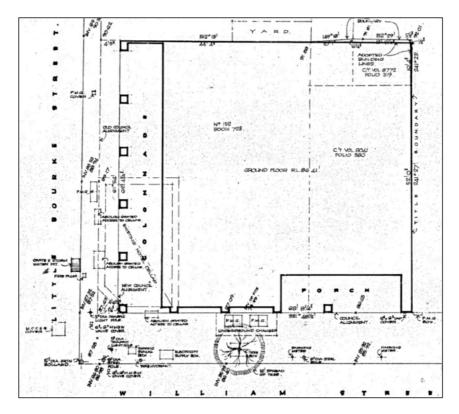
Ground floor plan of the building at 178-188 William Street, Melbourne, c1972.Source: Building Application Plans, CoM, from citation.
